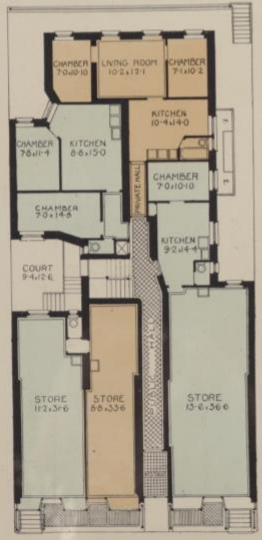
A model tenement house. 224-226 Avenue B; Plan of first floor; Plan of upper floors., 1908, Publisher: G.C. Hesselgren Pub. Co. Built by Charles I. Weinstein, 1904 / Architect - Geo. F. Pelham.
